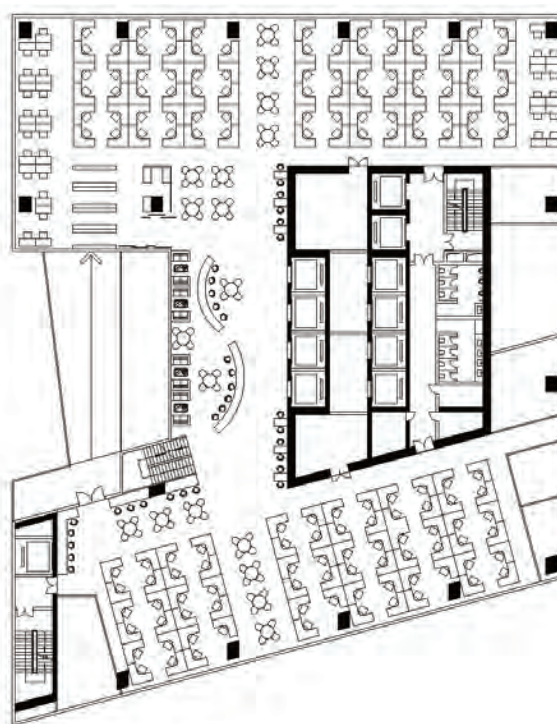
Typical floor plan of east tower (Source: CCDI Group)
